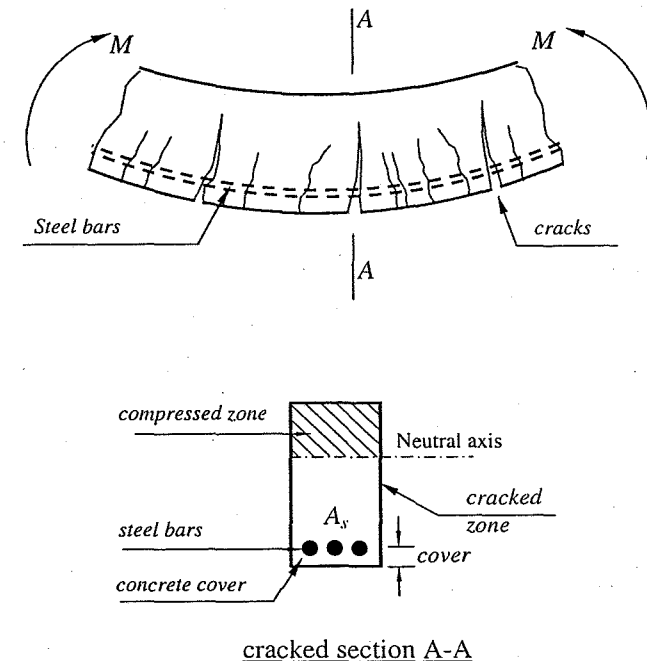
Reinforcement placement in reinforced concrete beam
